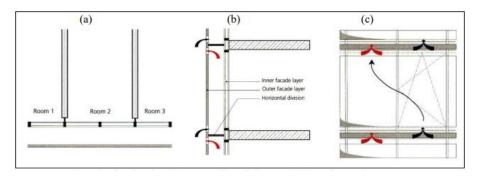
Corridor facade type: (a) plan, (b) section, (c) elevation (Azarbayjani, 2010)
